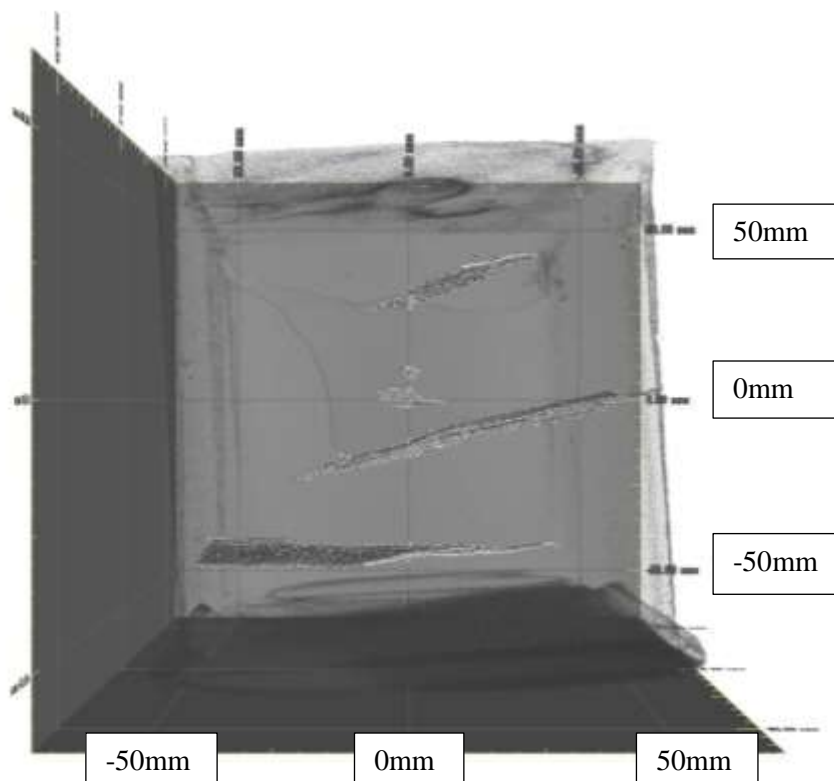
WBS3 Overhead View Predrill Scan.
